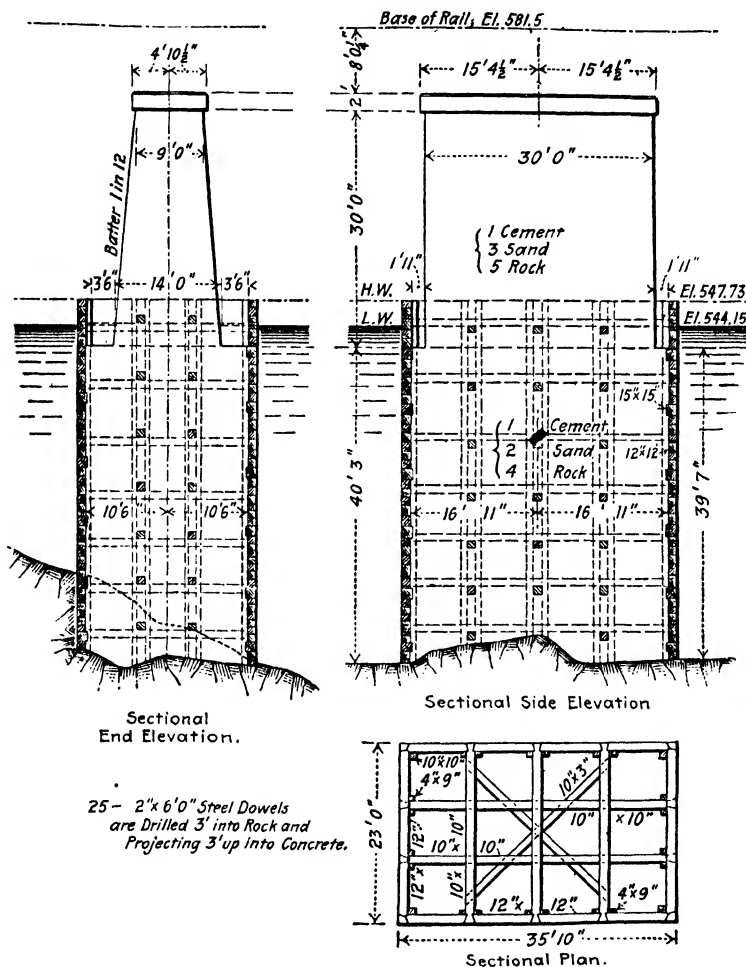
Open Caisson for Canadian Pacific Railway Bridge over French River.
